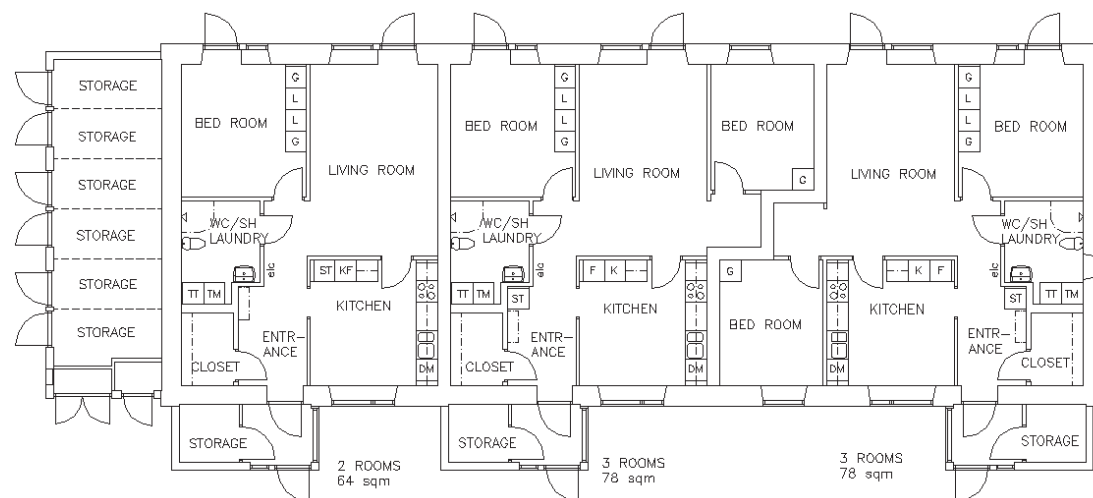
The floor plan of one of the terrace houses (Mats Abrahamsson Arkitektkontor AB)
